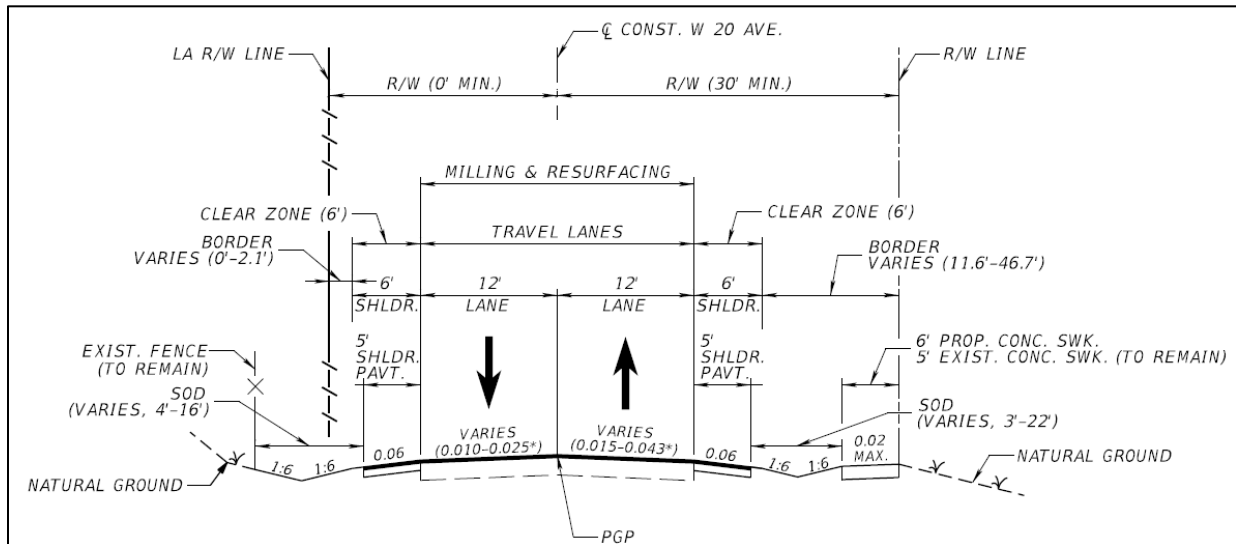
Proposed Frontage Road (Undivided) – Typical Section 1 (East Frontage Road/W 20th Avenue)
